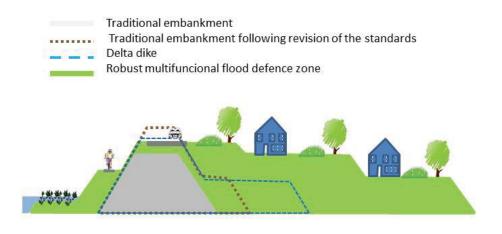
Scheme of a traditional embankment, a traditional reinforcement, a delta dike, and a robust multifunctional flood defence zone (adapted after Silva & Van Velzen, 2008; and STOWA, 2011).
